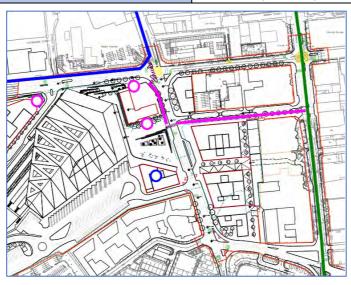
Plan illustrating Belfast Transport Hub in relation to Belfast Cycle Network and location of proposed bicycle parking stations
